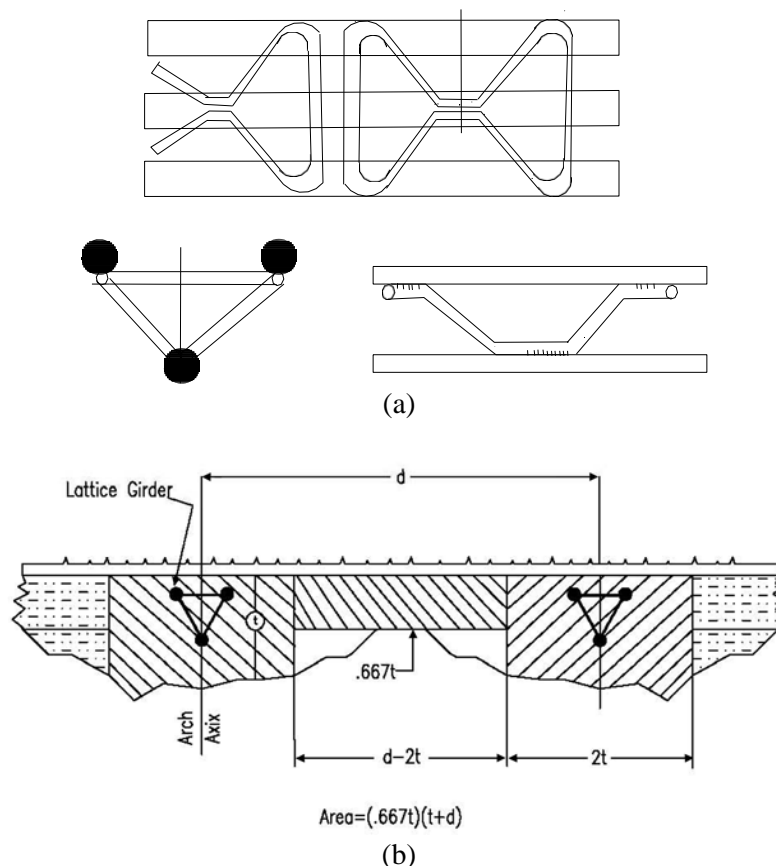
(a) Lattice Girder Configuration (Emilio-2-2901-1997); (b) Estimation of Cross Section for Shotcrete-encased Lattice Girders (Emilio-2-2901-1997)
